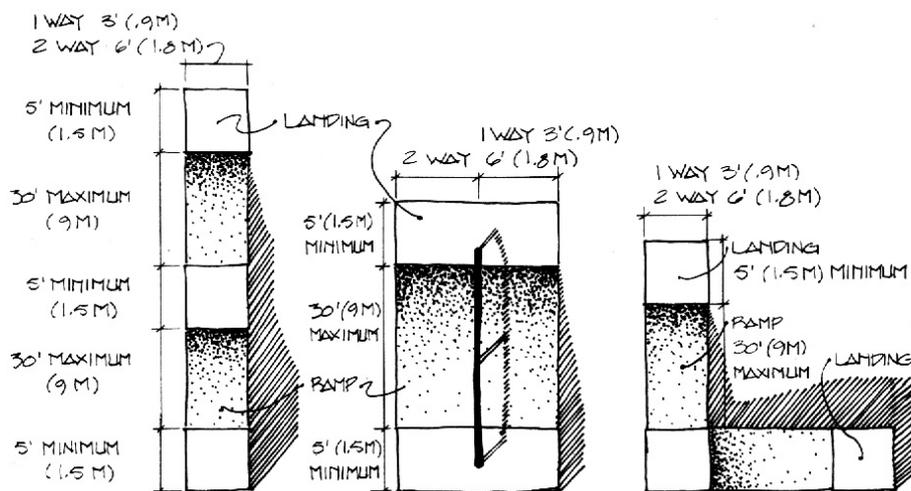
20: Typical ramp configurations. Regardless of the ramp configuration, all inclines and landings should be sufficiently dimensioned (Source: Harris 1988)
